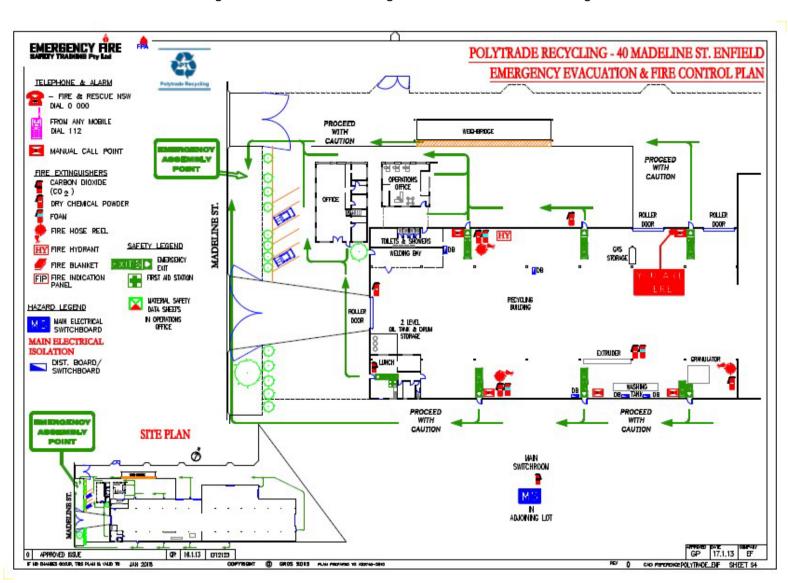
Location of fire extinguishers and fire hoses: MRF building
